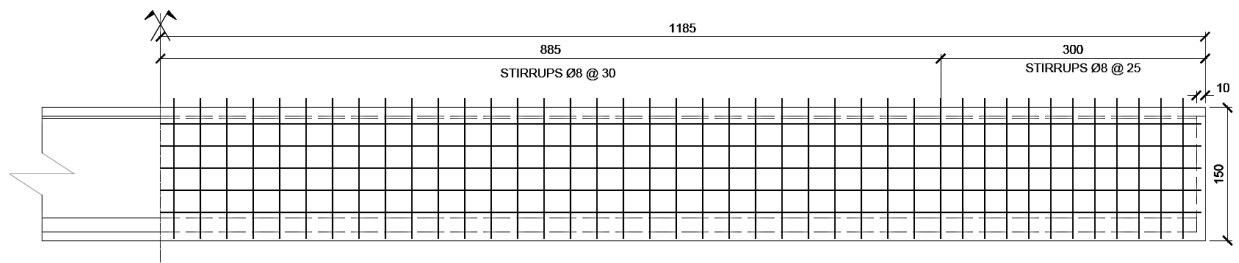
Elevation of the precast beam for transversal reinforcement layout (units in cm).
